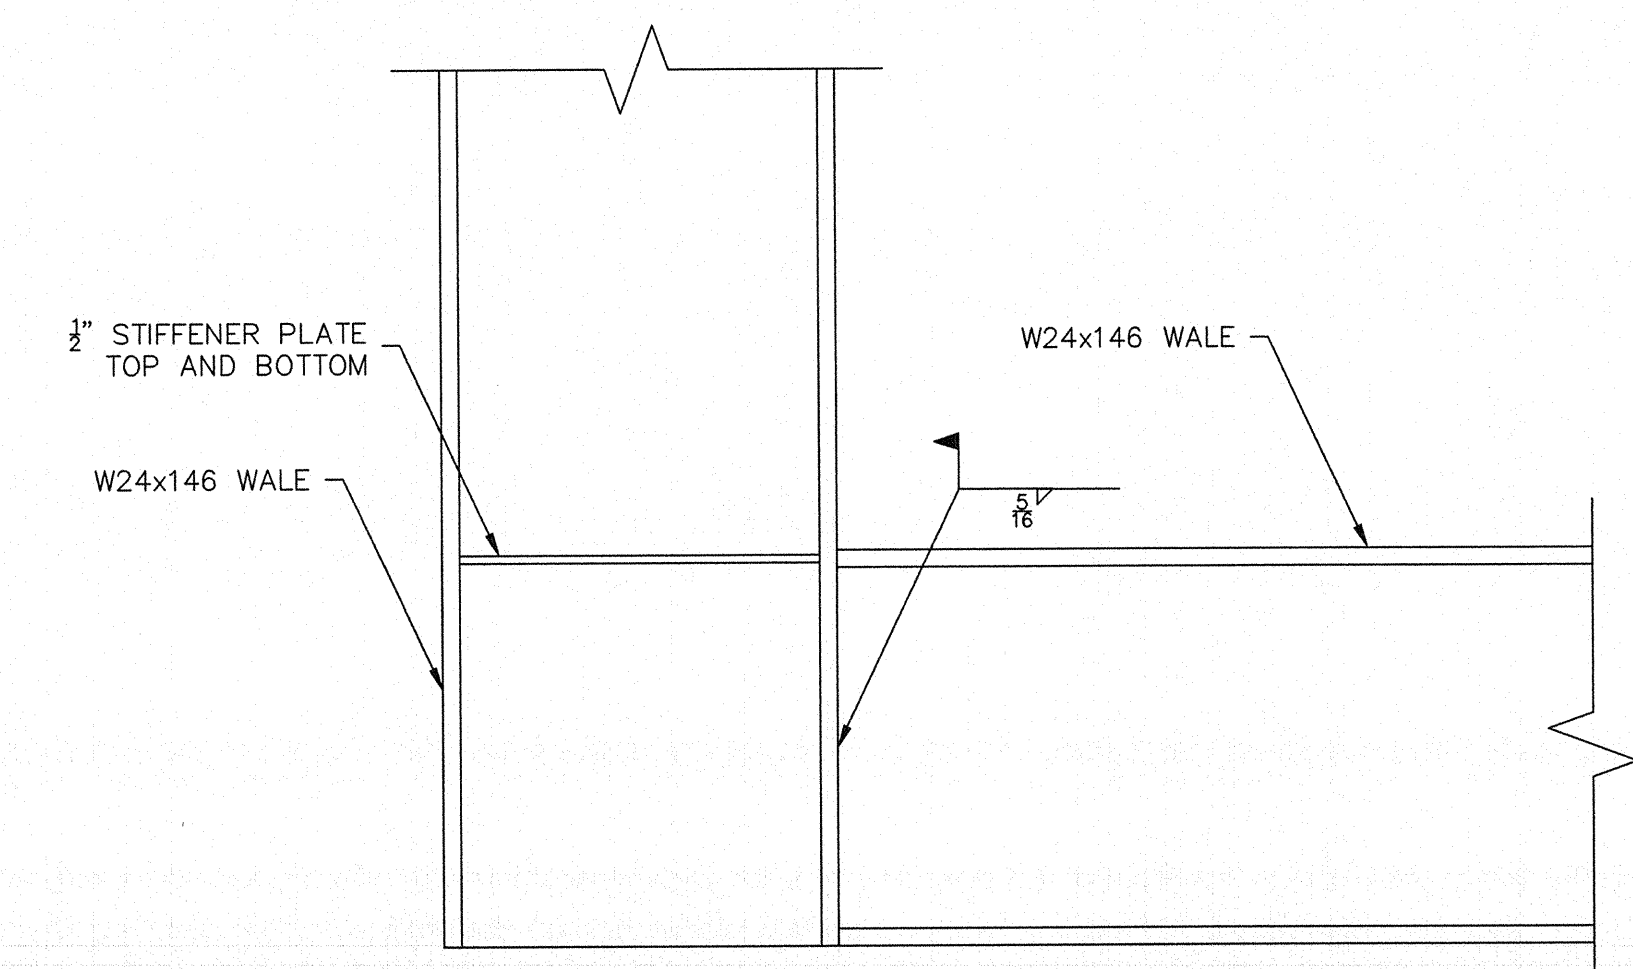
TYPICAL WALE CONNECTION @ KNEE BRACE (PLAN VIEW)
